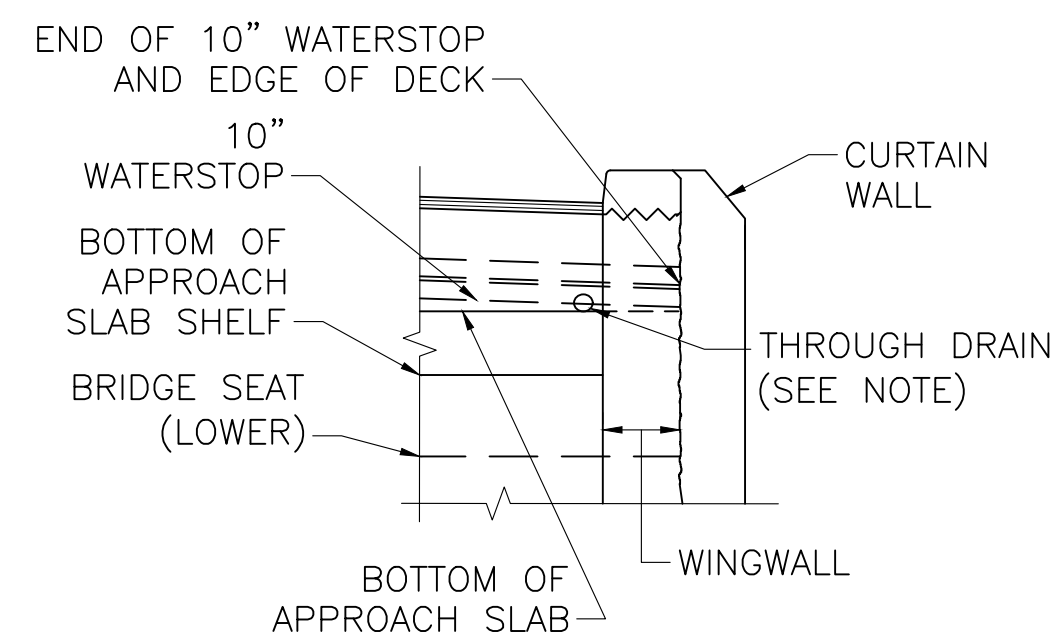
DETAILS AT ABUTMENT - UTILITY BAY SECTION
